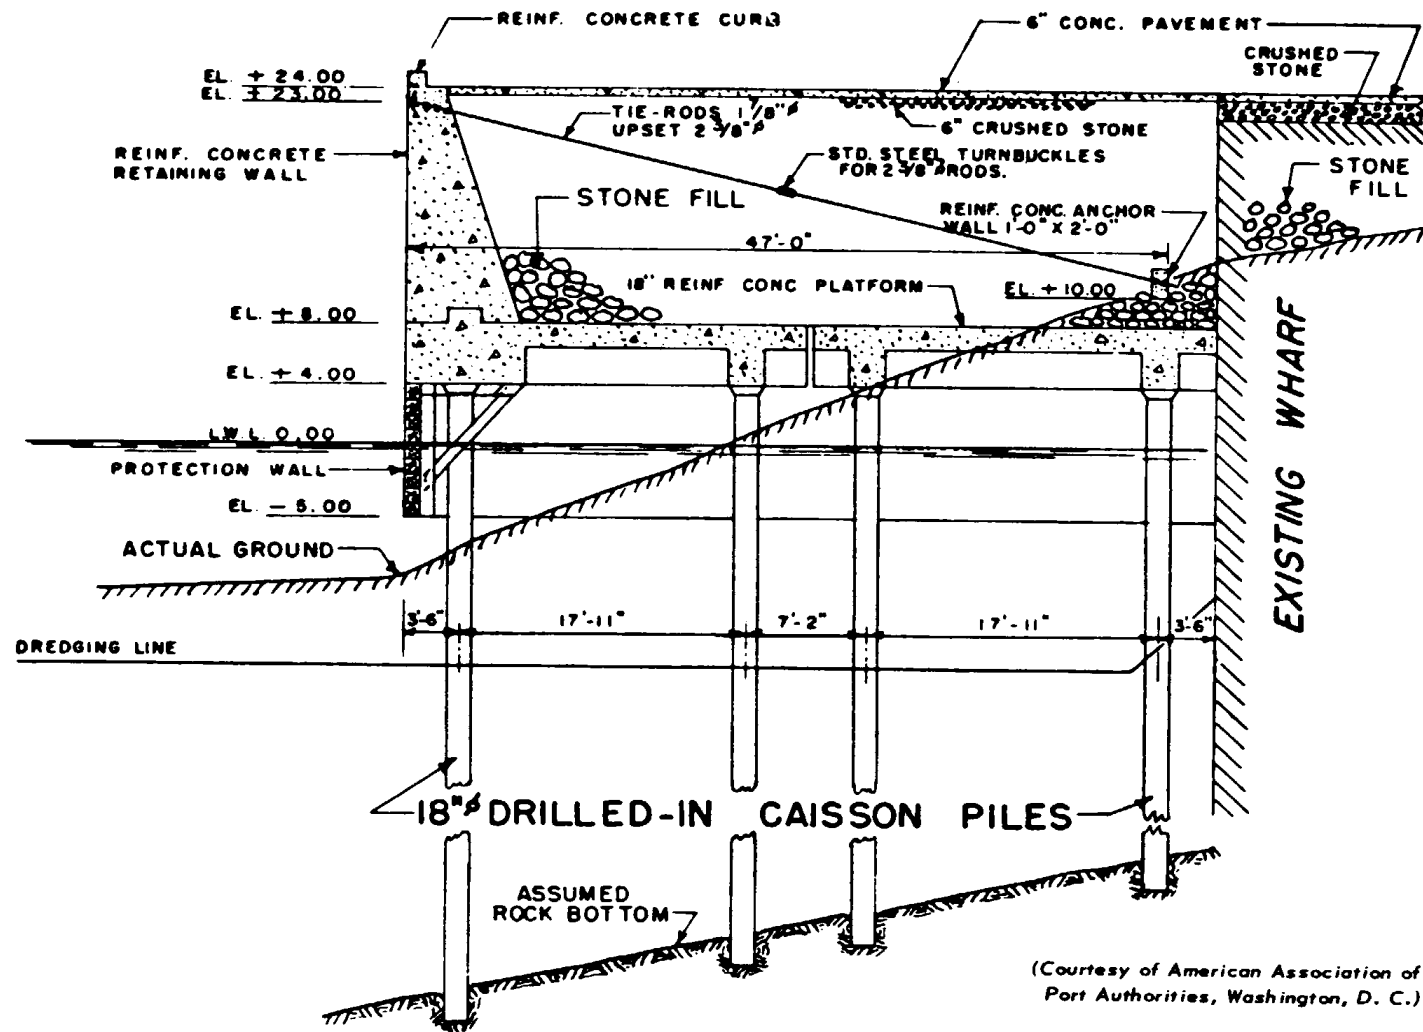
Open-Type Wharf Construction with Concrete Relieving Platform on Caisson Piles.
